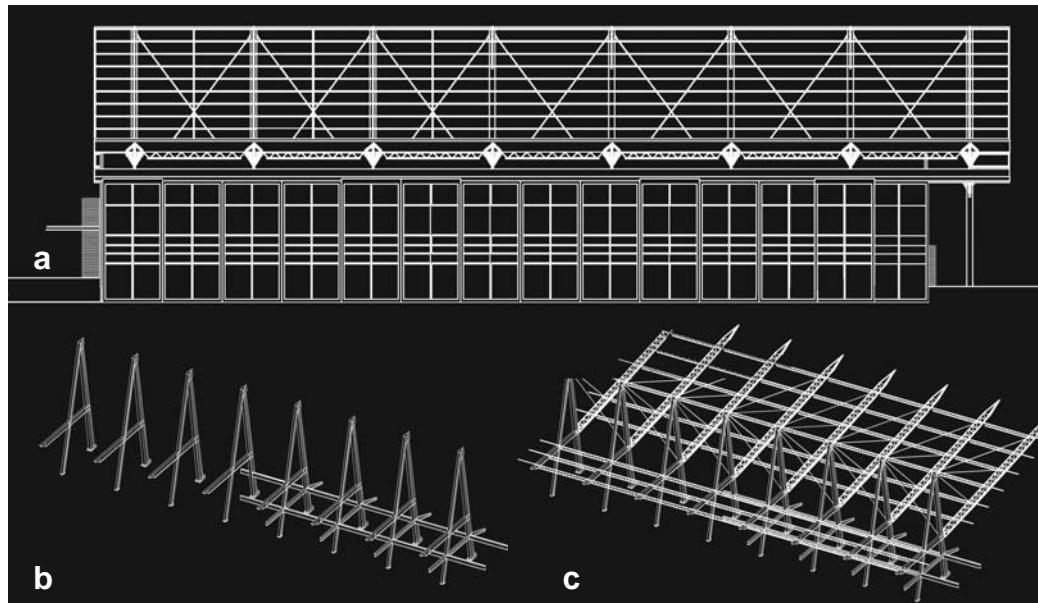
Structure: (a) north elevation, (b) primary frame, and (c) roof.
